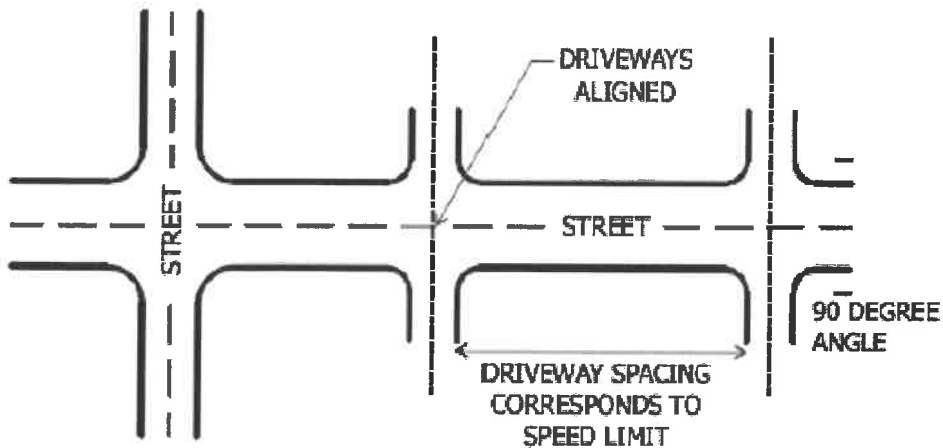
E: Illustration of minimum driveway spacing requirements.
